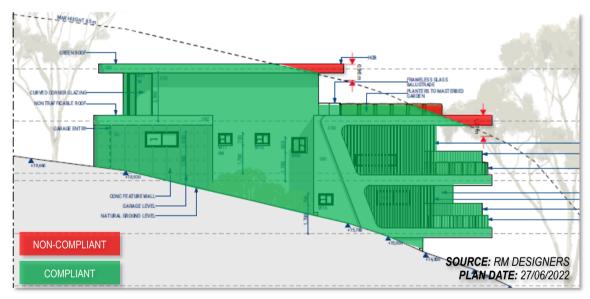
EXTRACT AND MARK-UP FROM NORTH ELEVATION INDICATING HEIGHT LIMIT BREACH
